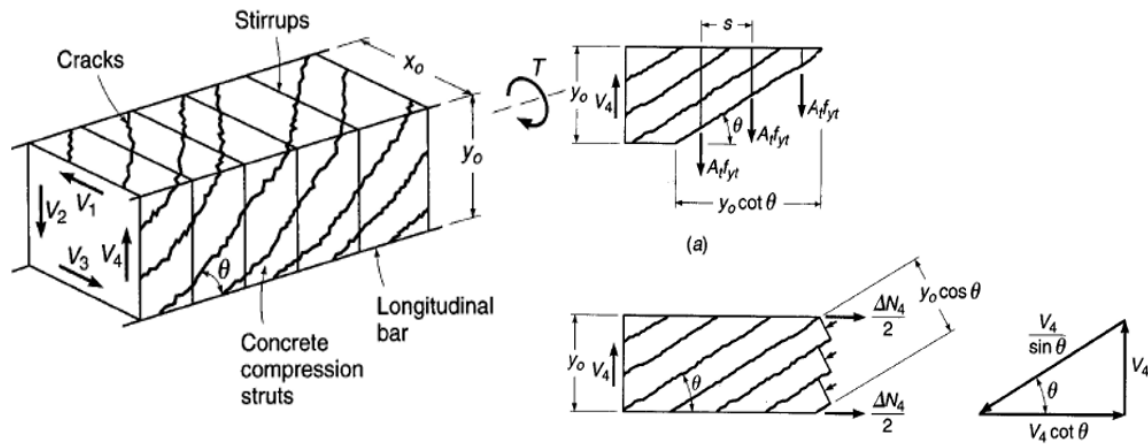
Space truss model of a reinforced concrete beam (Darwin et al. 2016)
